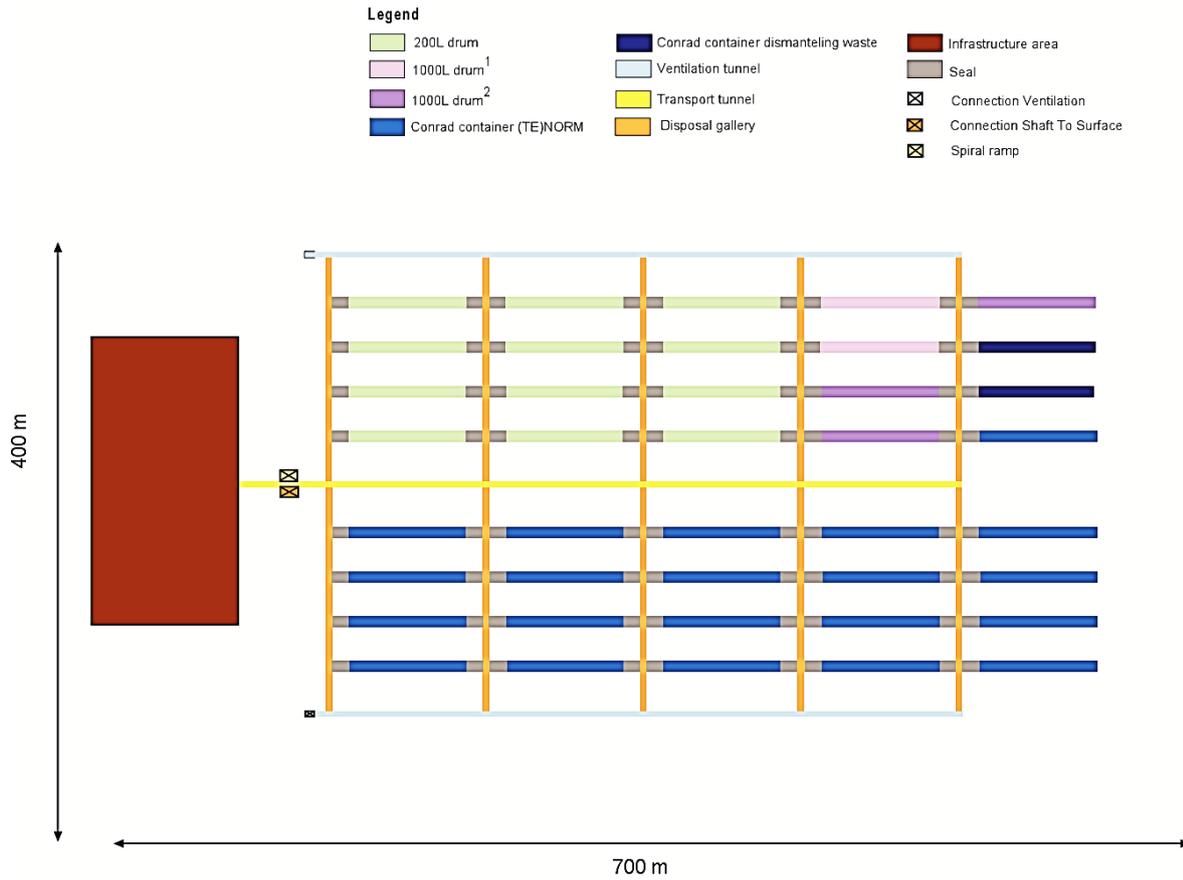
Draft layout of the LILW/(TE) NORM disposal level (-750 mNN) of the generic Dutch repository concept. Disposal chambers for small drums are green, for large 1000-l-containers violett, and for KONRAD containers dark blue. Central transport tunnel is yellow, access tunnels for disposal chambers are orange and marginal ventilation tunnels are marked light blue.
